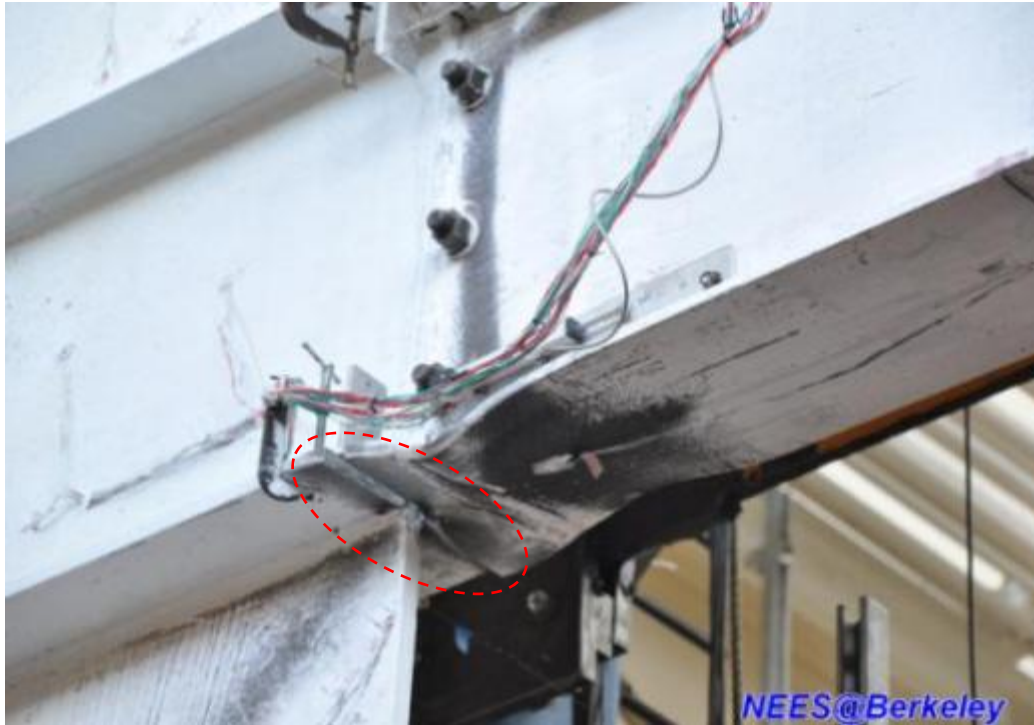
Specimen TCBF-B-2: complete fracture of east-side lower beam bottom flange finger plate.
